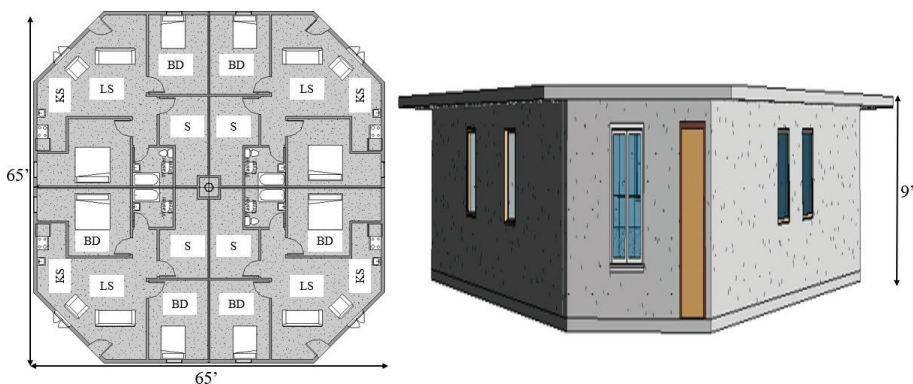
Proposed floor plan and elevation of designed shelter (Revit 2023).
